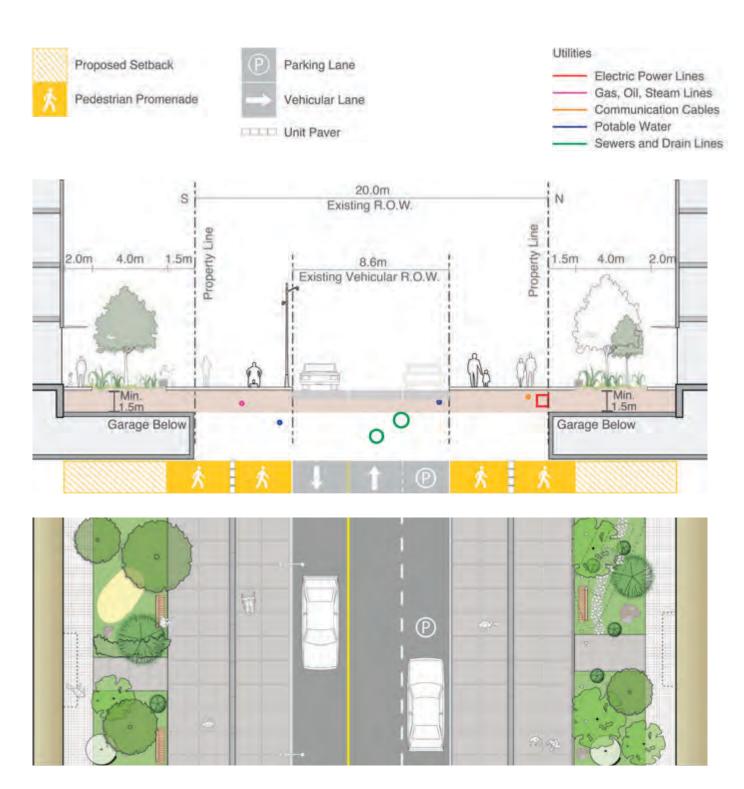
Section and Plan of Broadway Avenue - Recommended Interim Condition
